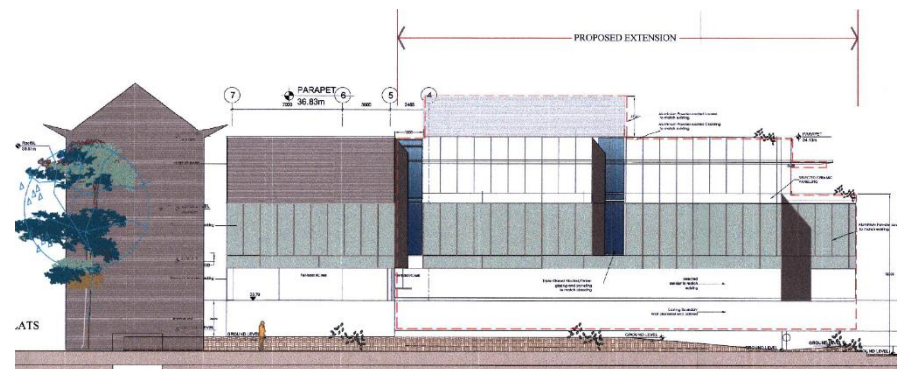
extract from 'East Elevation Proposed' from application drawings by Eoin Condon Architect
